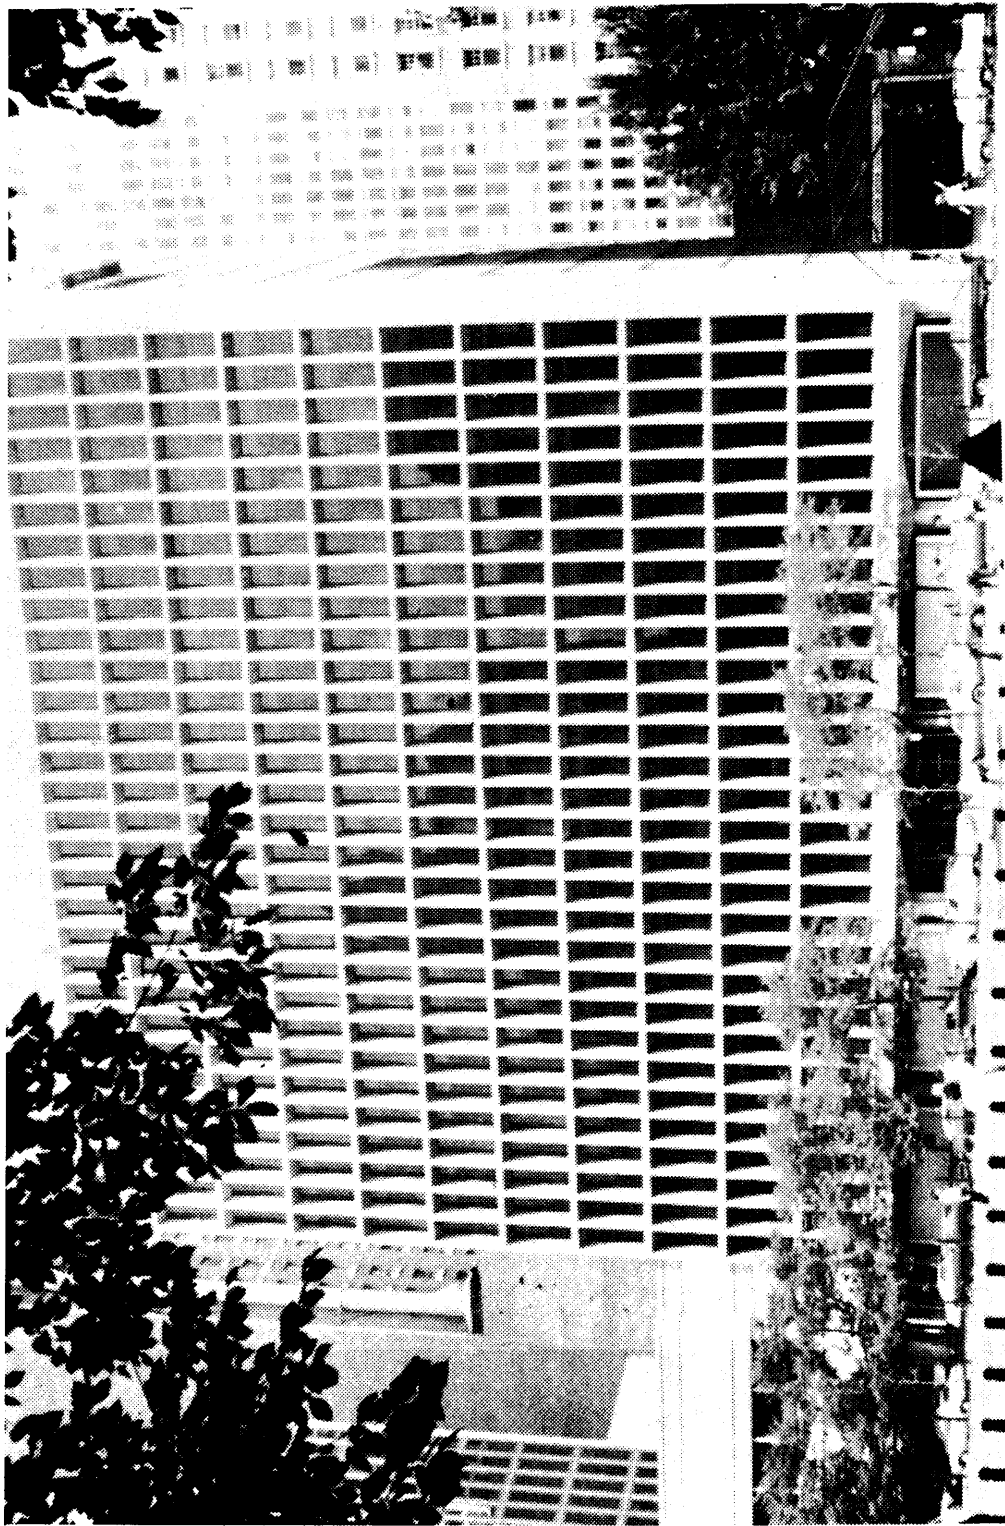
American Hospital Association Buildings, Chicago. The continuous transfer girder with 5 ft by 9 ft cross section floor level was the first to be designed by the ACI torsion criterion (refs. 8, 11)
